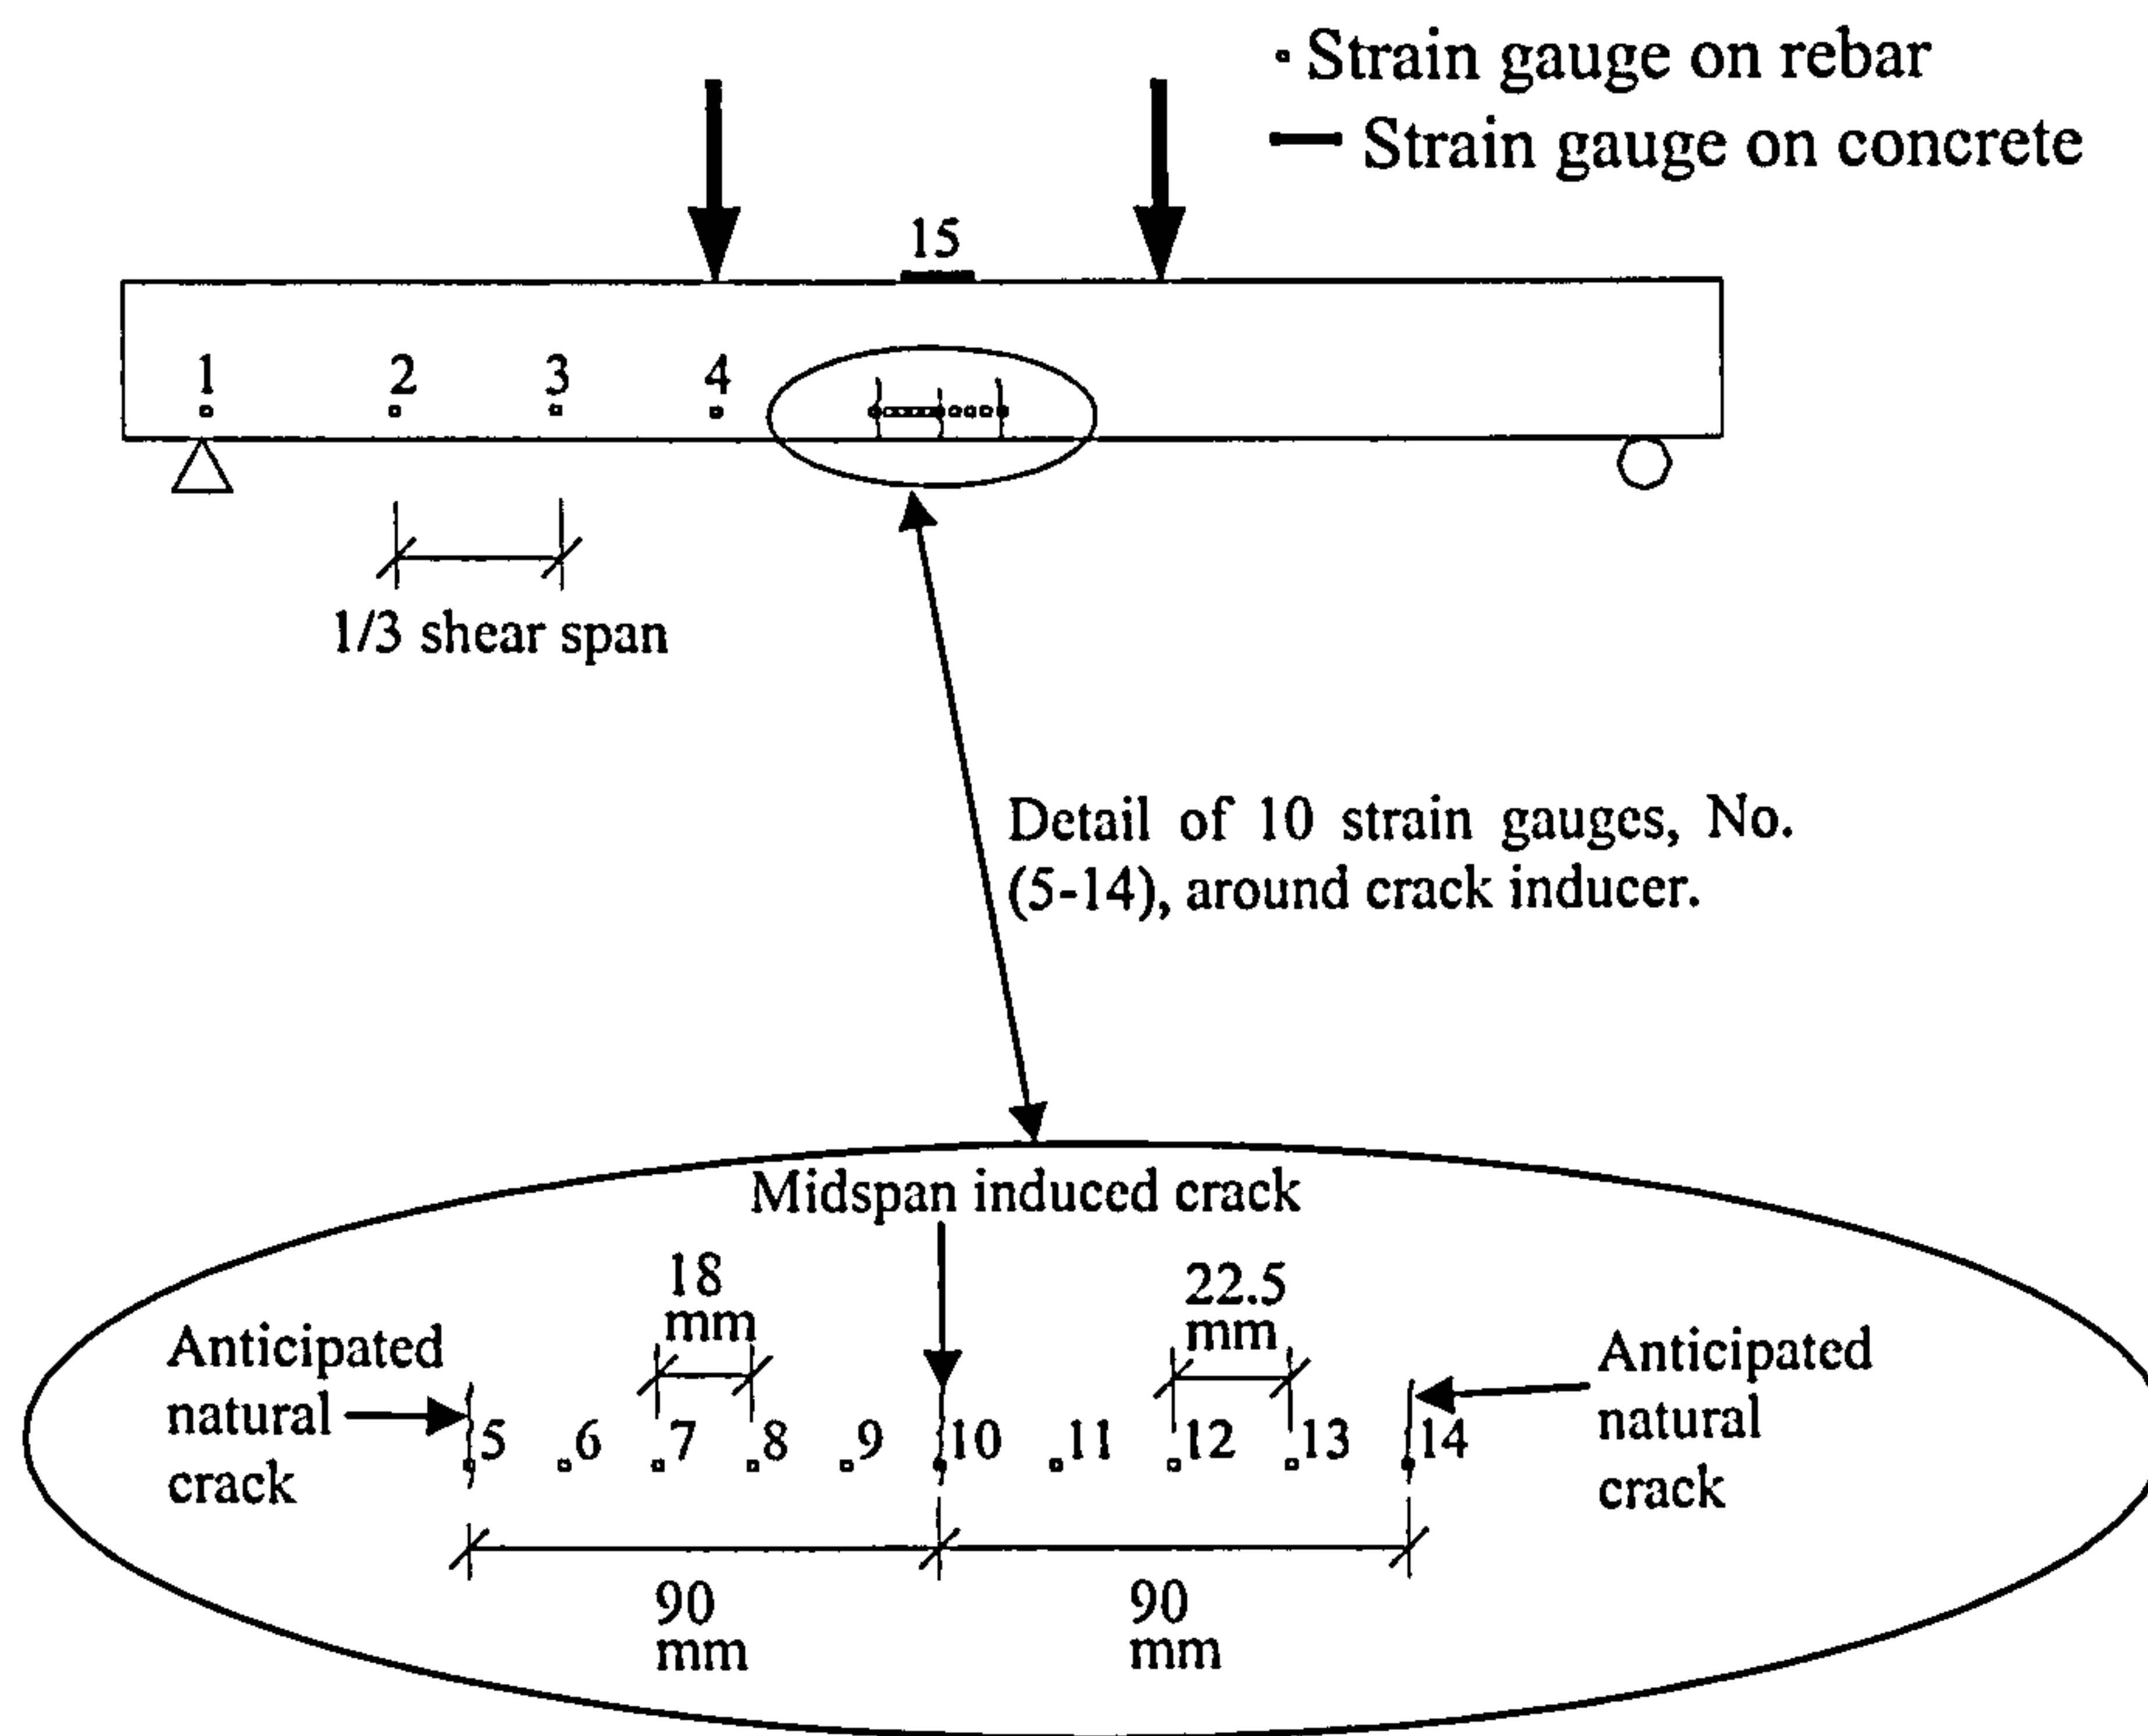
Arrangement of rebar and concrete strain gauges.
